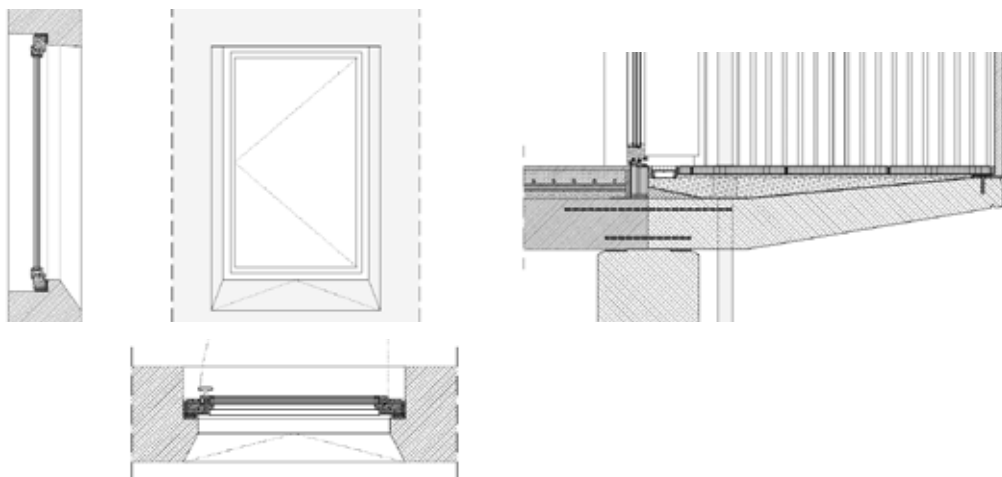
Exemplary structural details in ILC: window detail (left); ILC balcony connected to normal concrete inner slab (right) (Leibinger et al. 2016)
